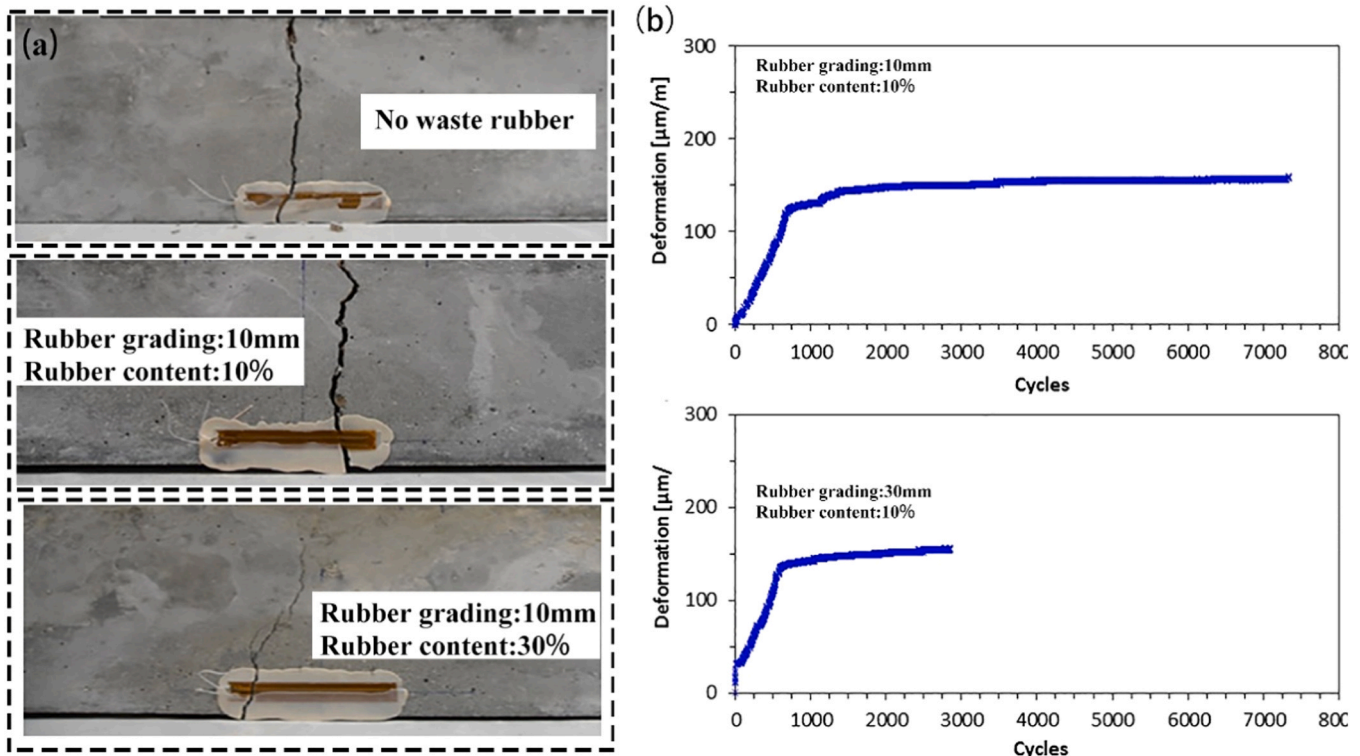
Waste rubber specimens (a) Failure cracks and (b) Deformation diagram after cyclic loading [135].
